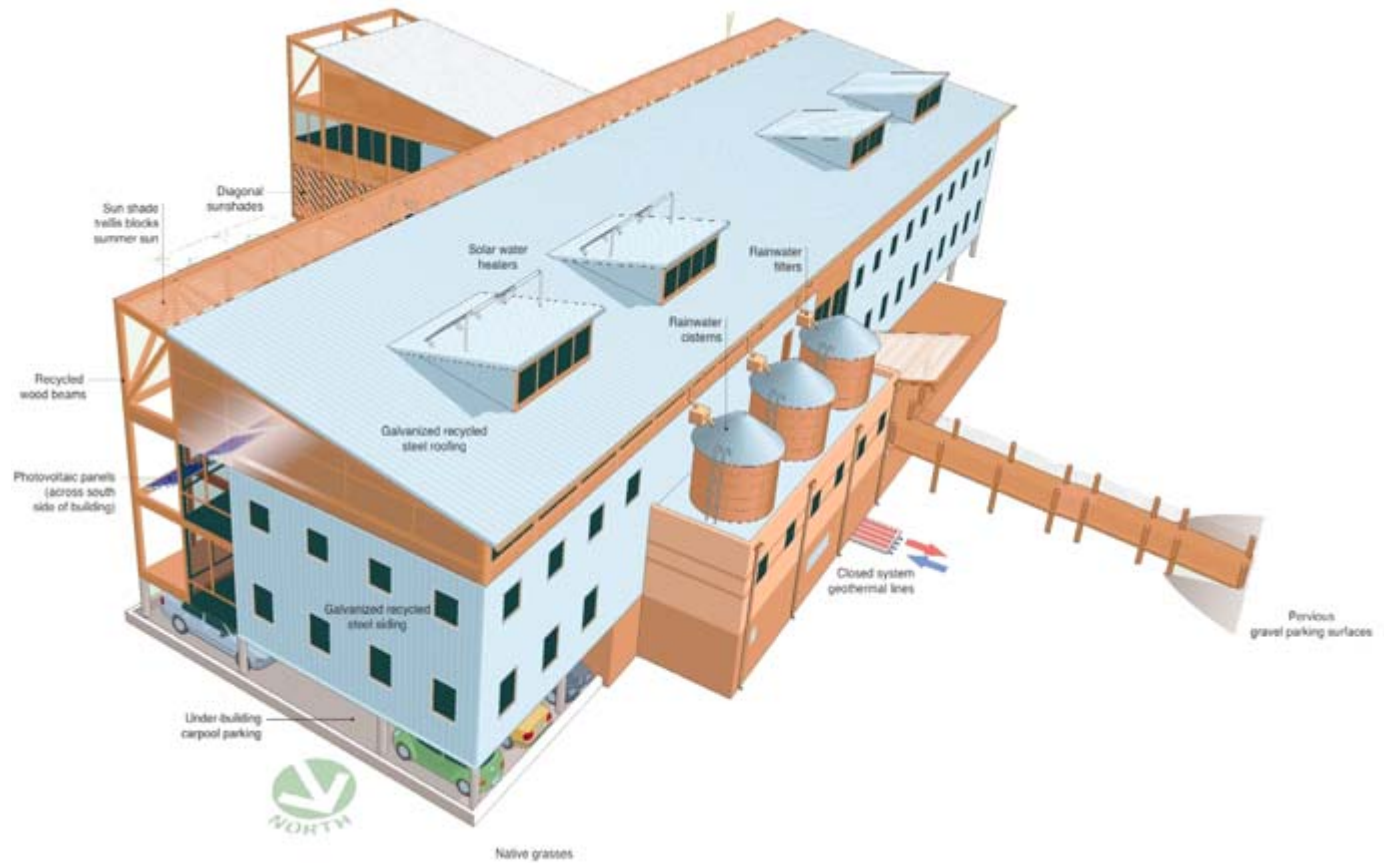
depicts the Merrill Center and highlights many of the energy design measures. Located at grade level under the first floor are a storage area, mechanical rooms, and an open air parking area, which prevents polluted runoff from entering the bay.
